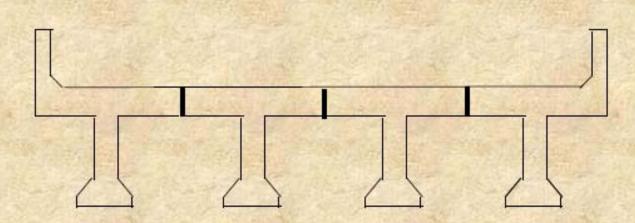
Integral Concrete Slab with Precast Concrete Tee Sections with Shear Keys and Transverse Post-Tensioning.
